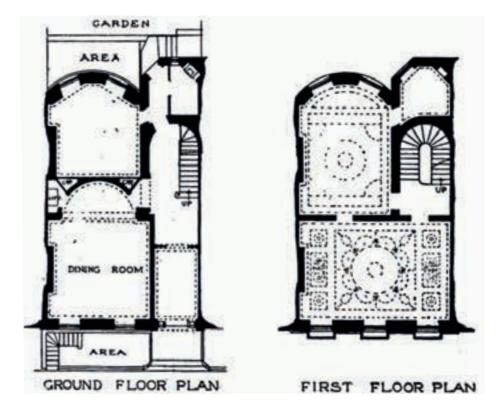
Plan showing the ground and first floors of 15 Bedford Square
